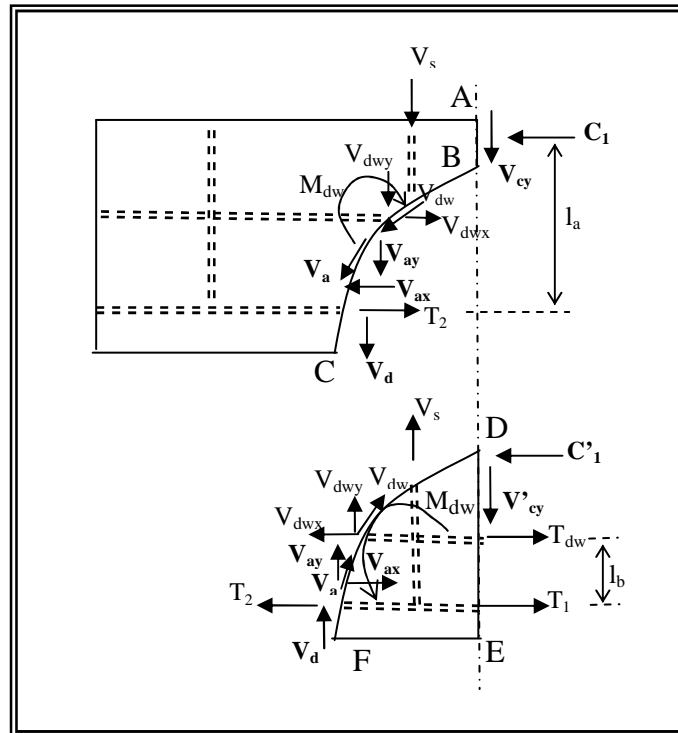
Internal forces in a cracked HSC4 beam with stirrups and HWB.
